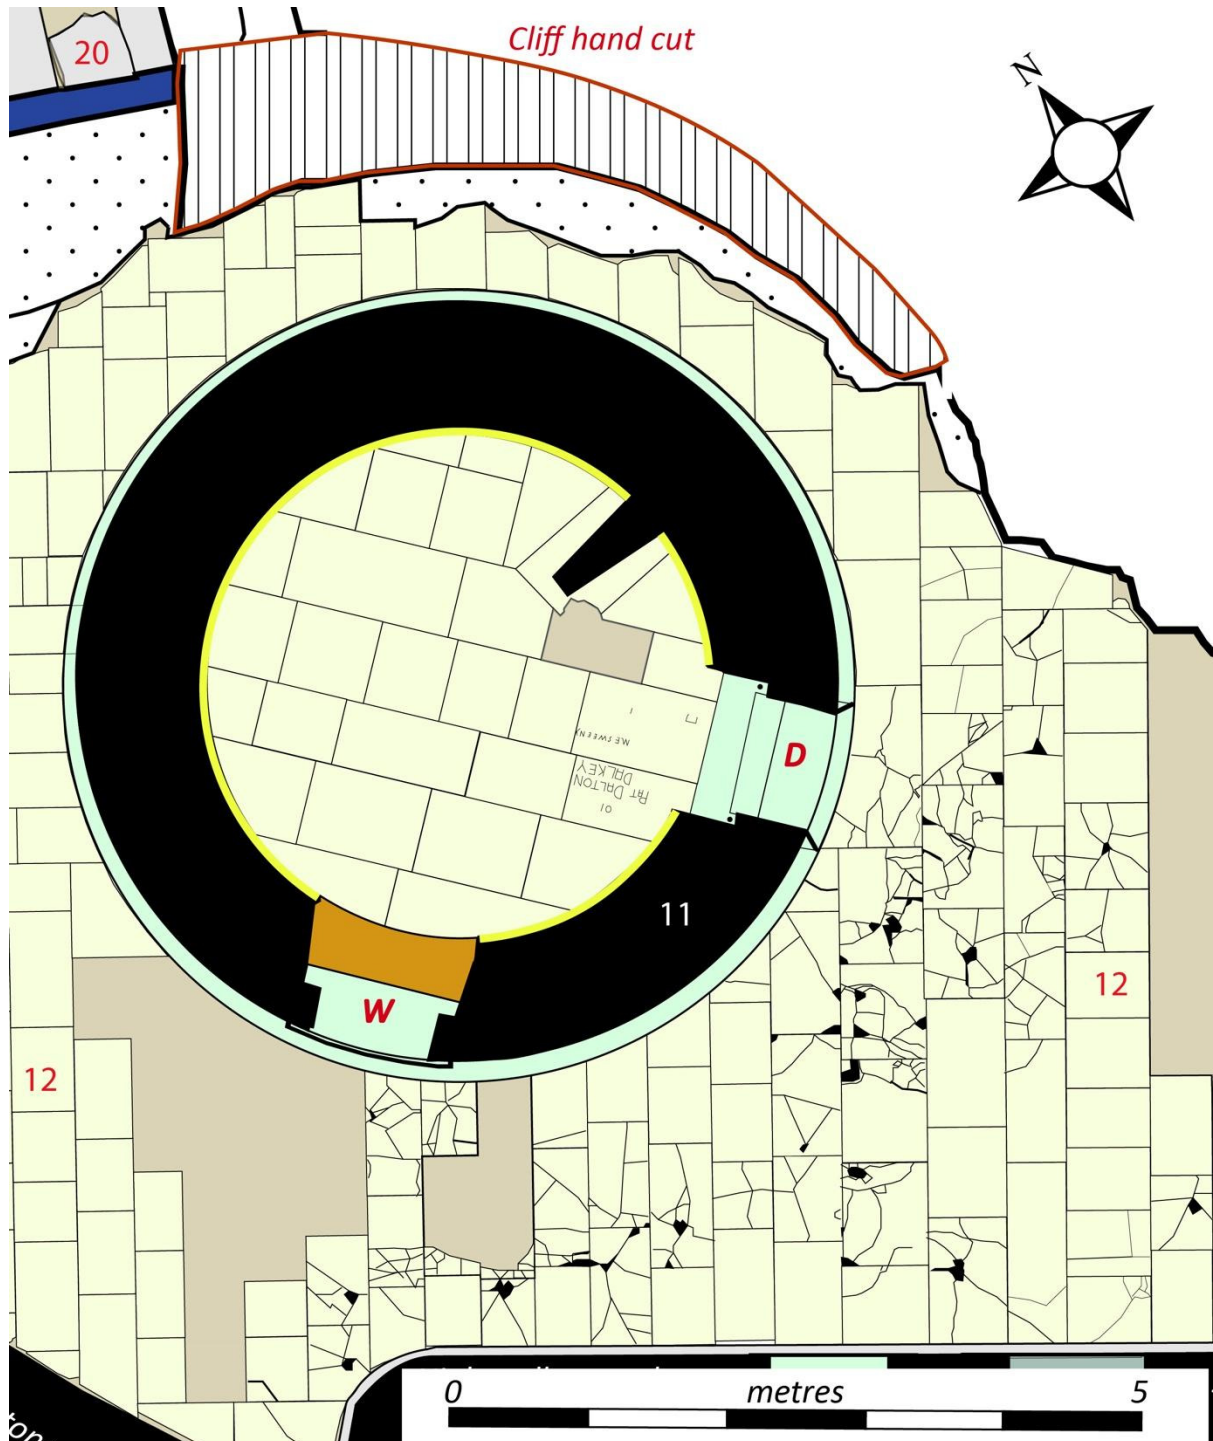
Post excavation plan of ground floor of the Lighthouse (11).
